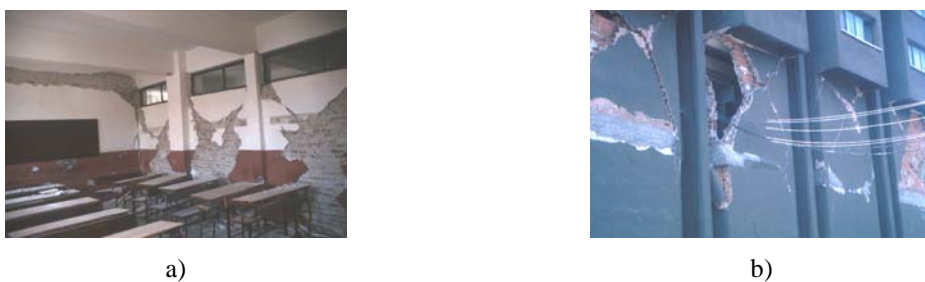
Damage on infill walls (Aschheim, 2001): a) infill cracking; b) in-plane infill failure
